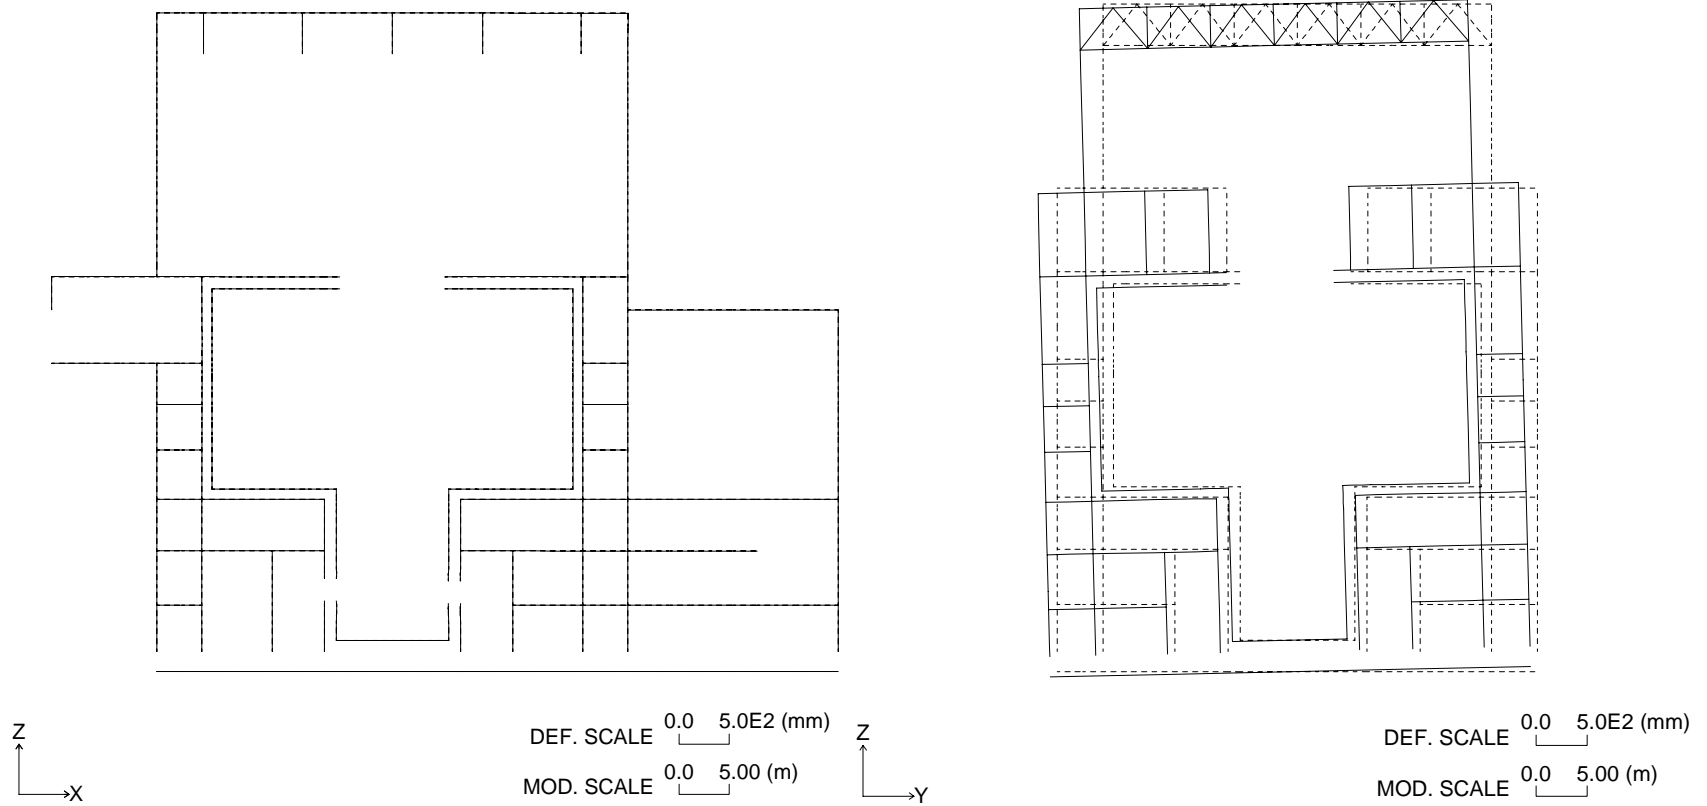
G.1-37. Section Deformation for Seismic Load (Horizontal: East to West)
